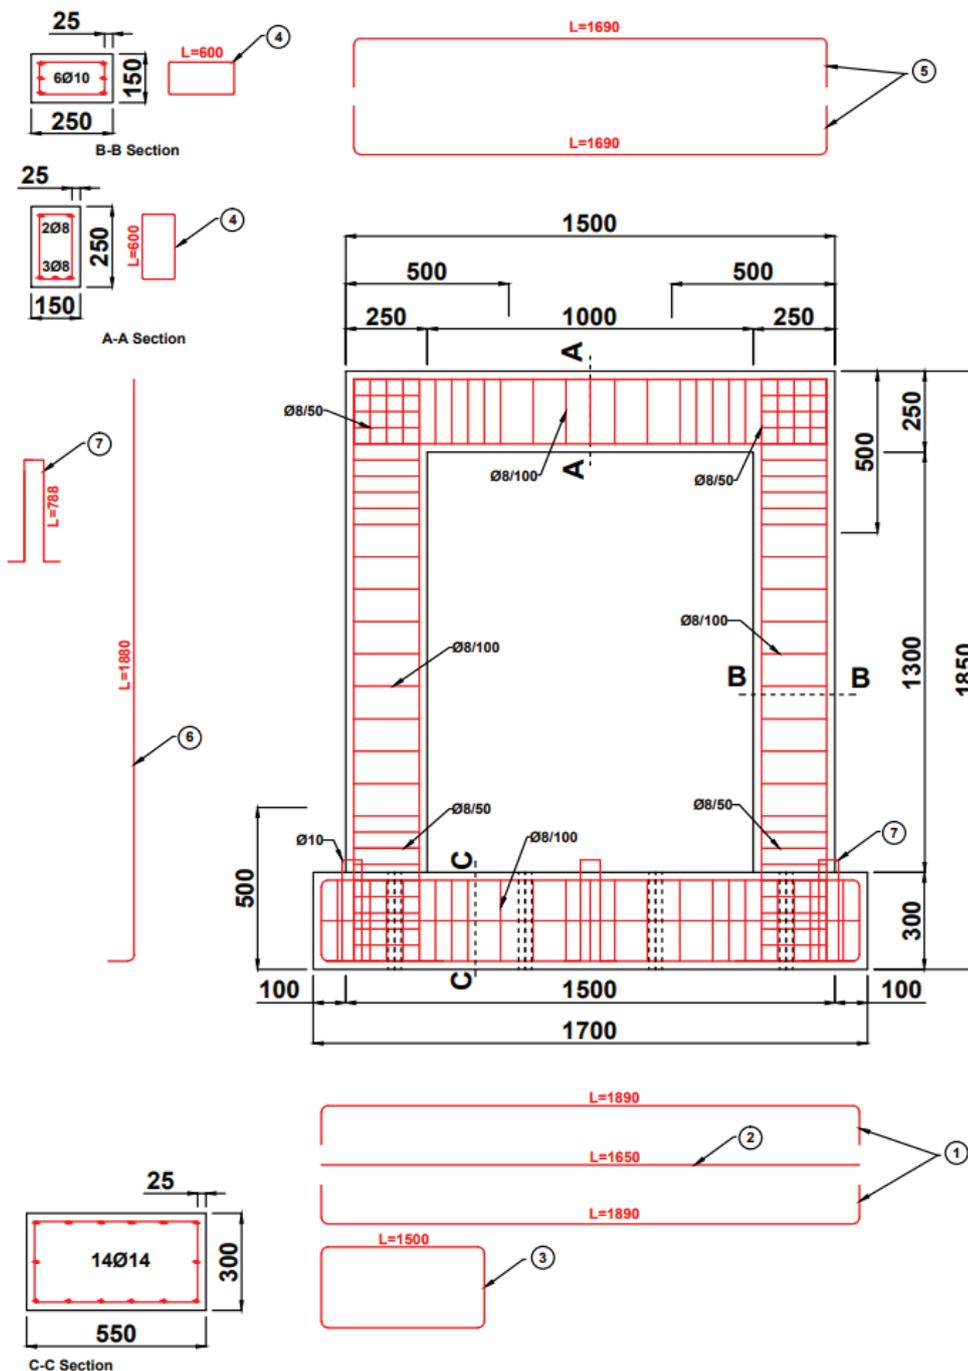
Reinforcement properties of reinforced concrete frame elements.
